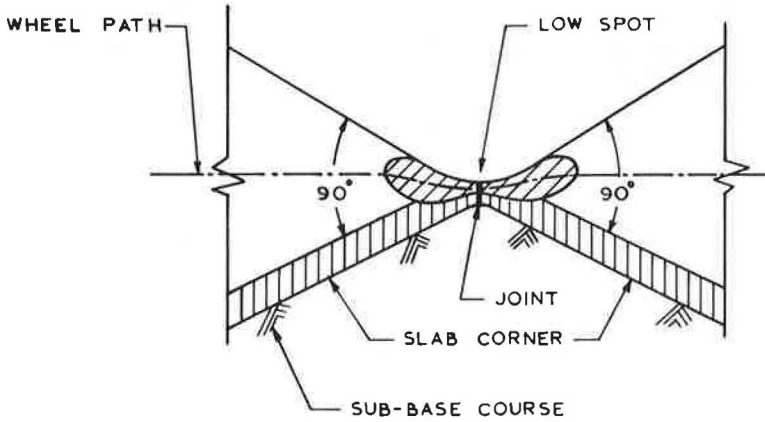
Low spot at adjacent slab corners of a concrete pavement.
